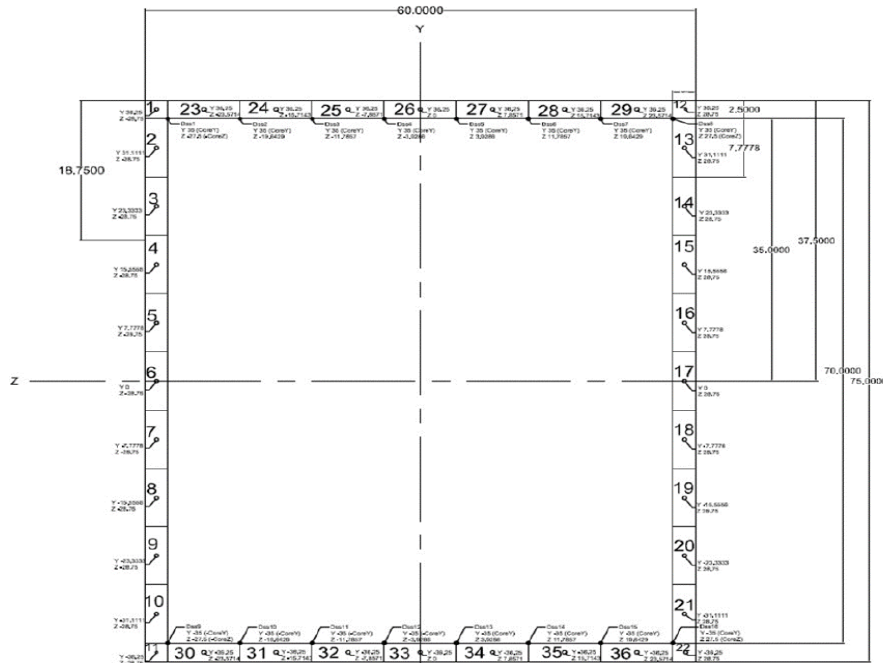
Concrete and Steel Fiber Numbering in the Cross Section
